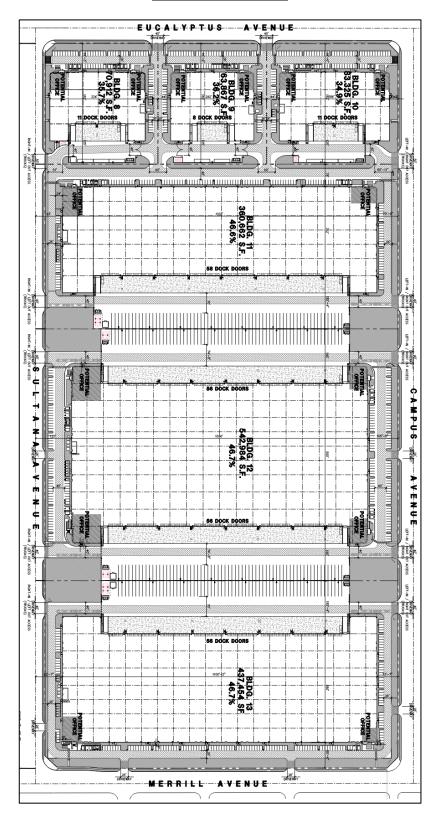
Exhibit D: CONCEPTUAL LANDSCAPE PLAN
